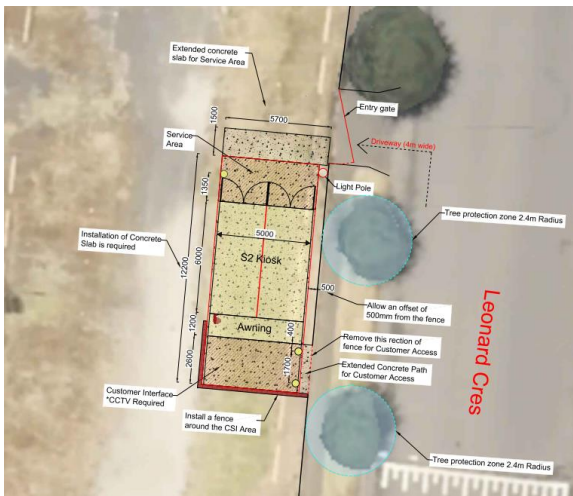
Proposed Floor Plan (Source: Decision Plans)
